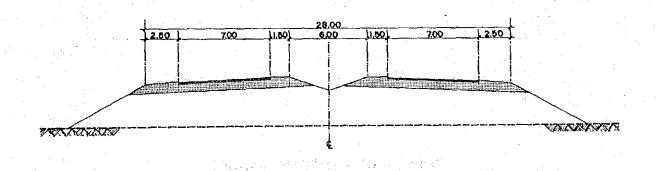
TYPICAL CROSS SECTION FOR FOUR LANE ROAD (NEW CONSTRUCTION)
